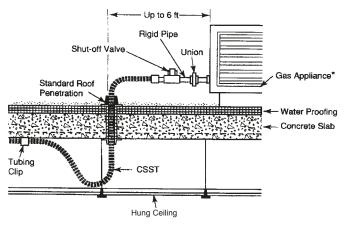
Short (1-6 foot) outdoor connection to roof mounted equipment
